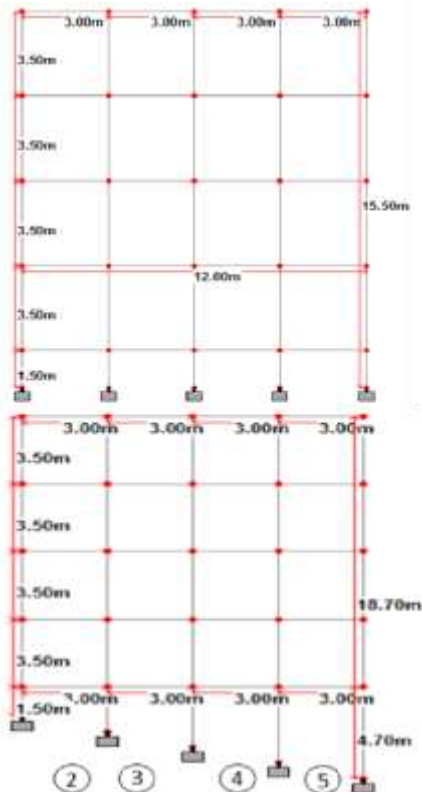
ELEVATION OF A INCLINED GROUND (0°)
